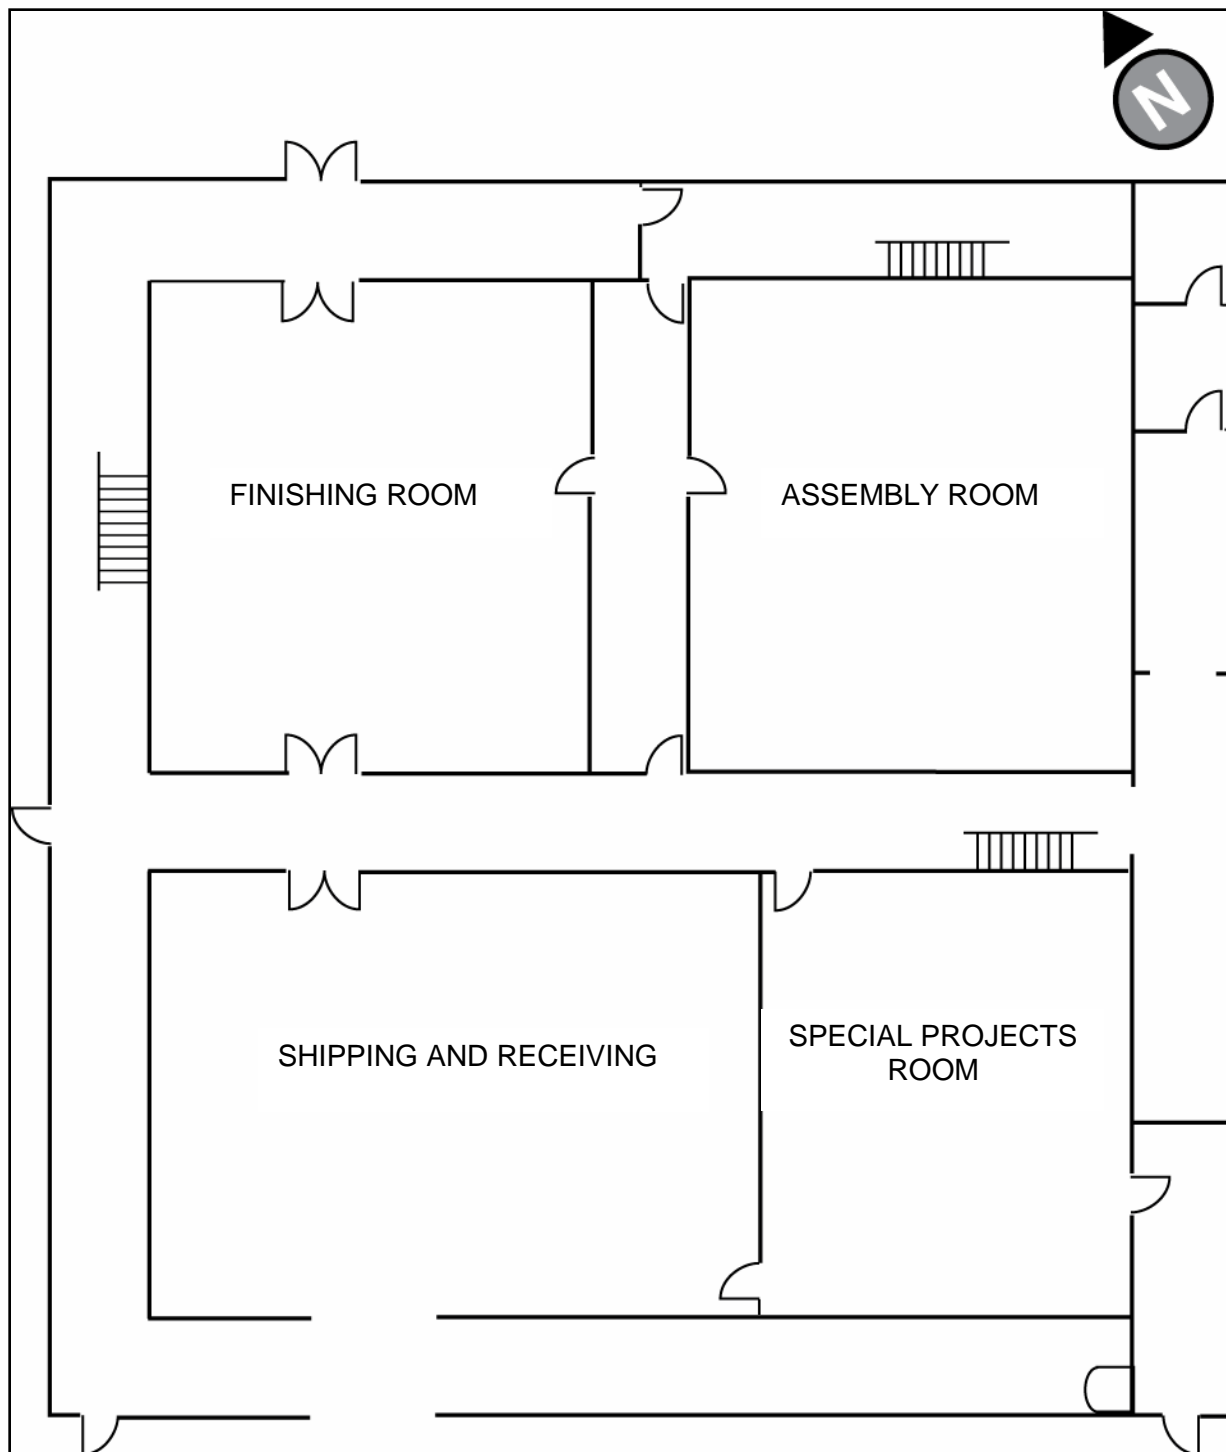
Floor Plan for Building 9825H, Special Projects Building, 1st Floor
